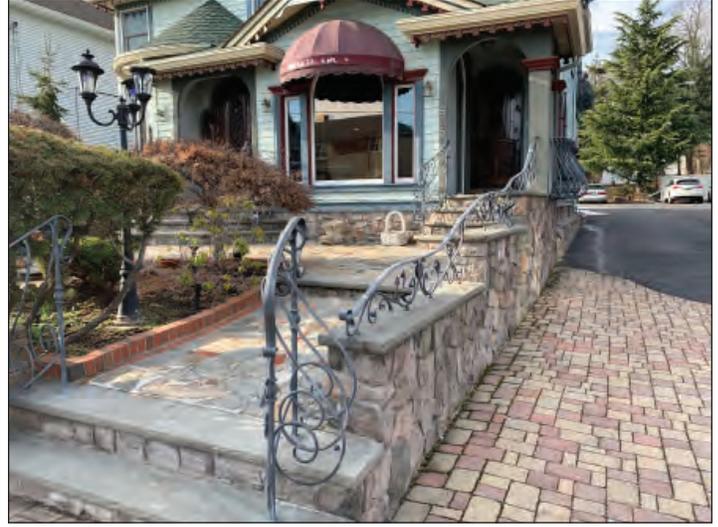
Landscaped patio/terrace requiring walking up at least seven (7) steps to building entrances.
